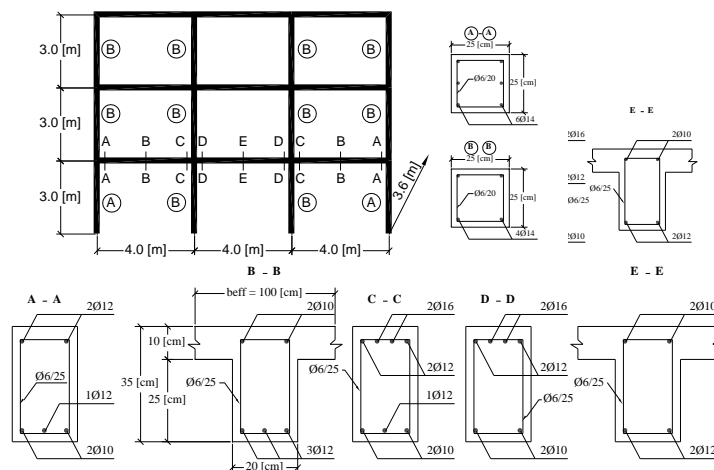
Frame geometry, characteristic beam and column cross-sections
